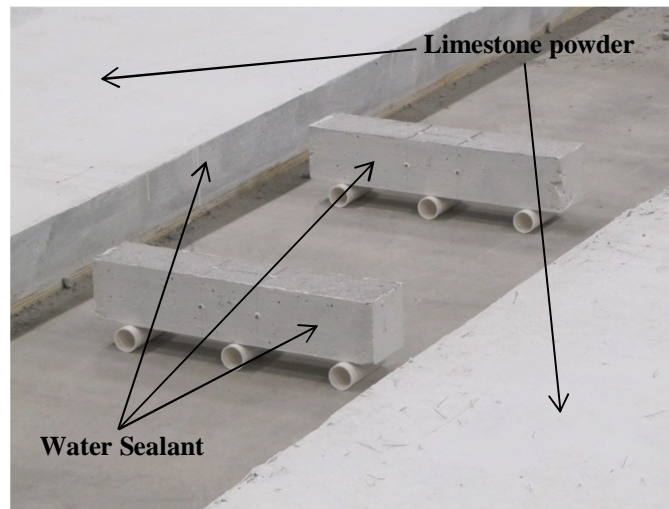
Sealant and limestone powder applied to the slabs and beams tested for shrinkage
